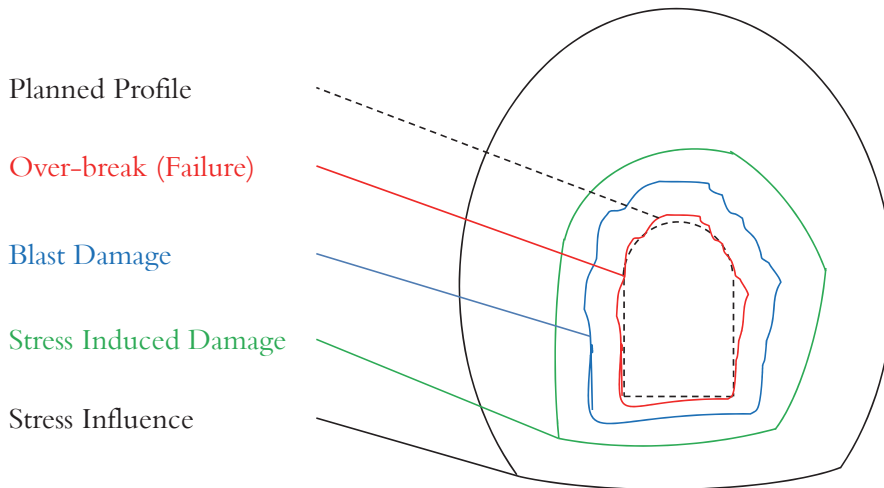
Excavation damage divided into subzones: over-break, blast damage, stress induced damage and stress influenced areas.
